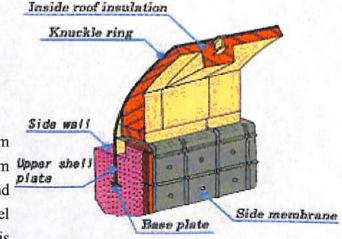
Roof inner insulation type structure of ruff and side wall
